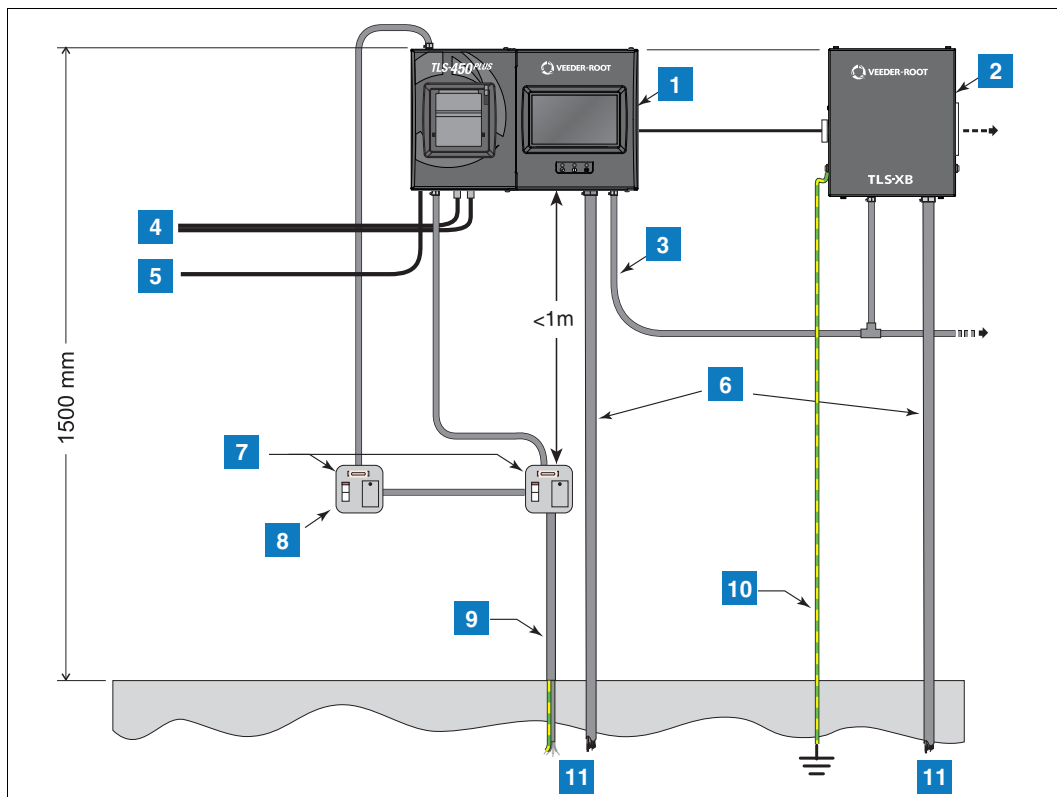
Example TLS-450PLUS/8600 Console With TLS-XB Installation
